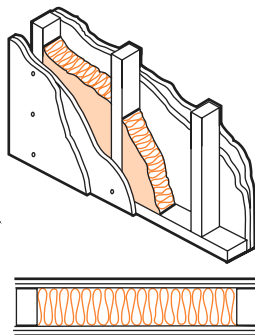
Conventional wood stud construction, double layer gypsum wallboard each side. Increased mass boosts STC rating to 46.
